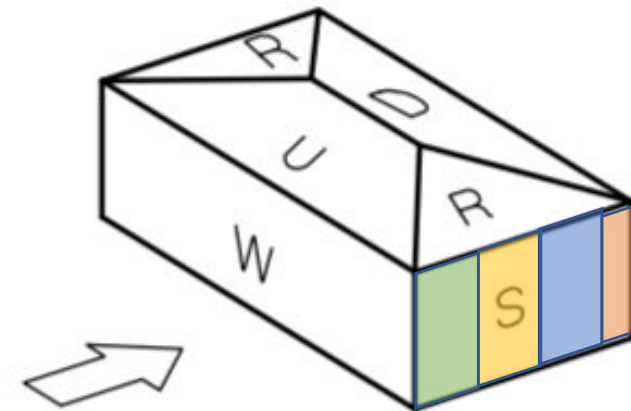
PARAMETERS FOR RECTANGULAR ENCLOSED BUILDINGS
